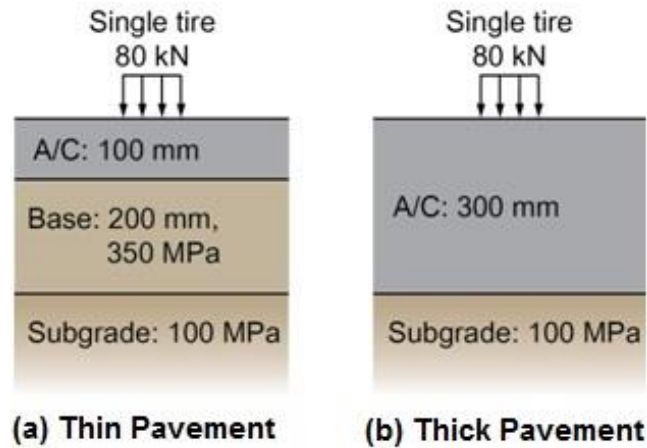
Pavement structure used in LVECD simulations for (a) thin pavement, and (b) thick pavement
